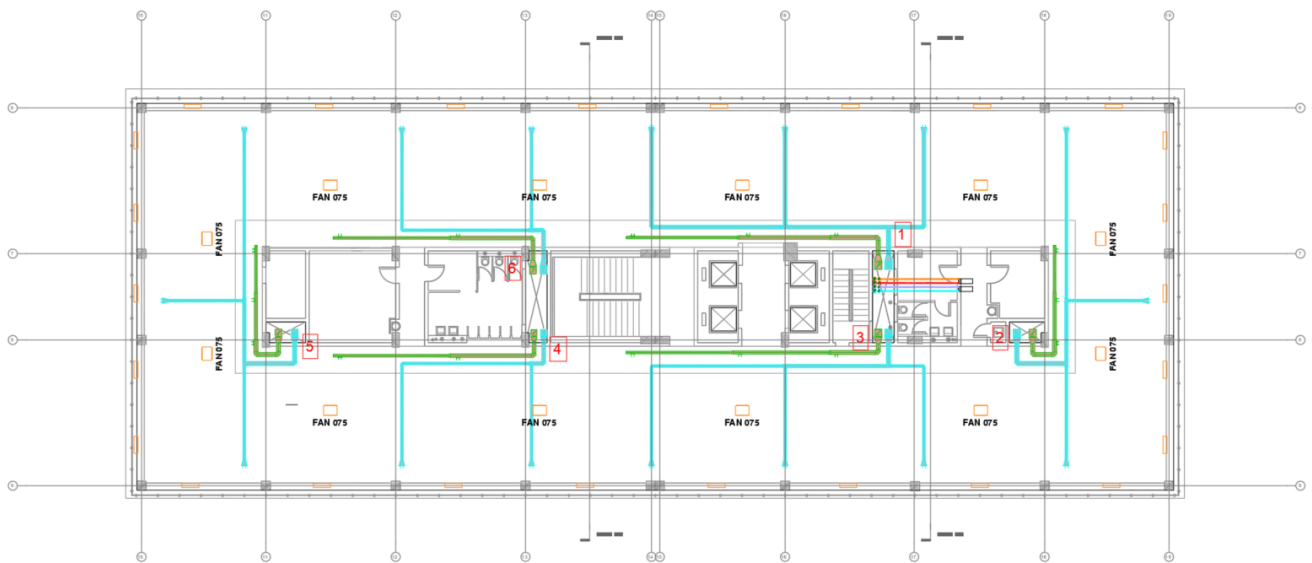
Plan view of standard plan, alternative 1 (source: AIGUASOL).
